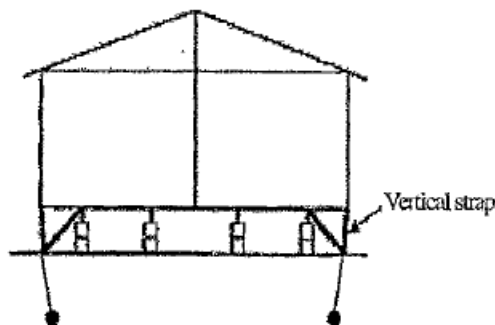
Anchor Strap and Pier Relationship.
